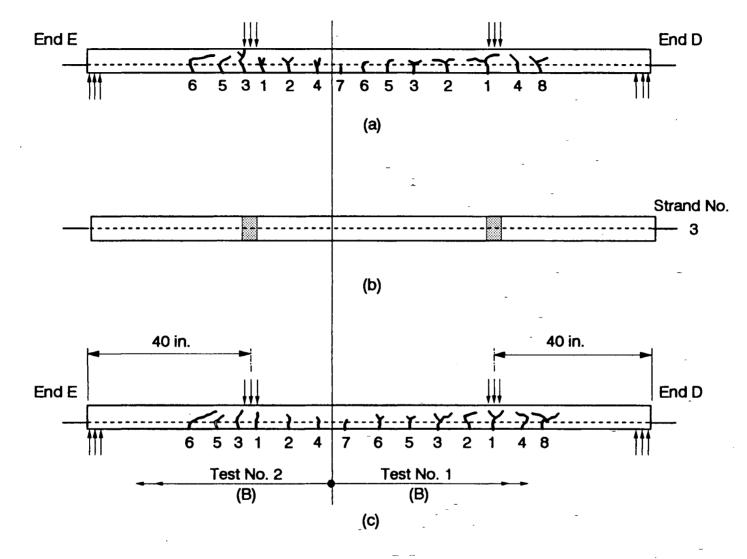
Crack patterns for D-type Specimen No. 11-6.0DU-11:
